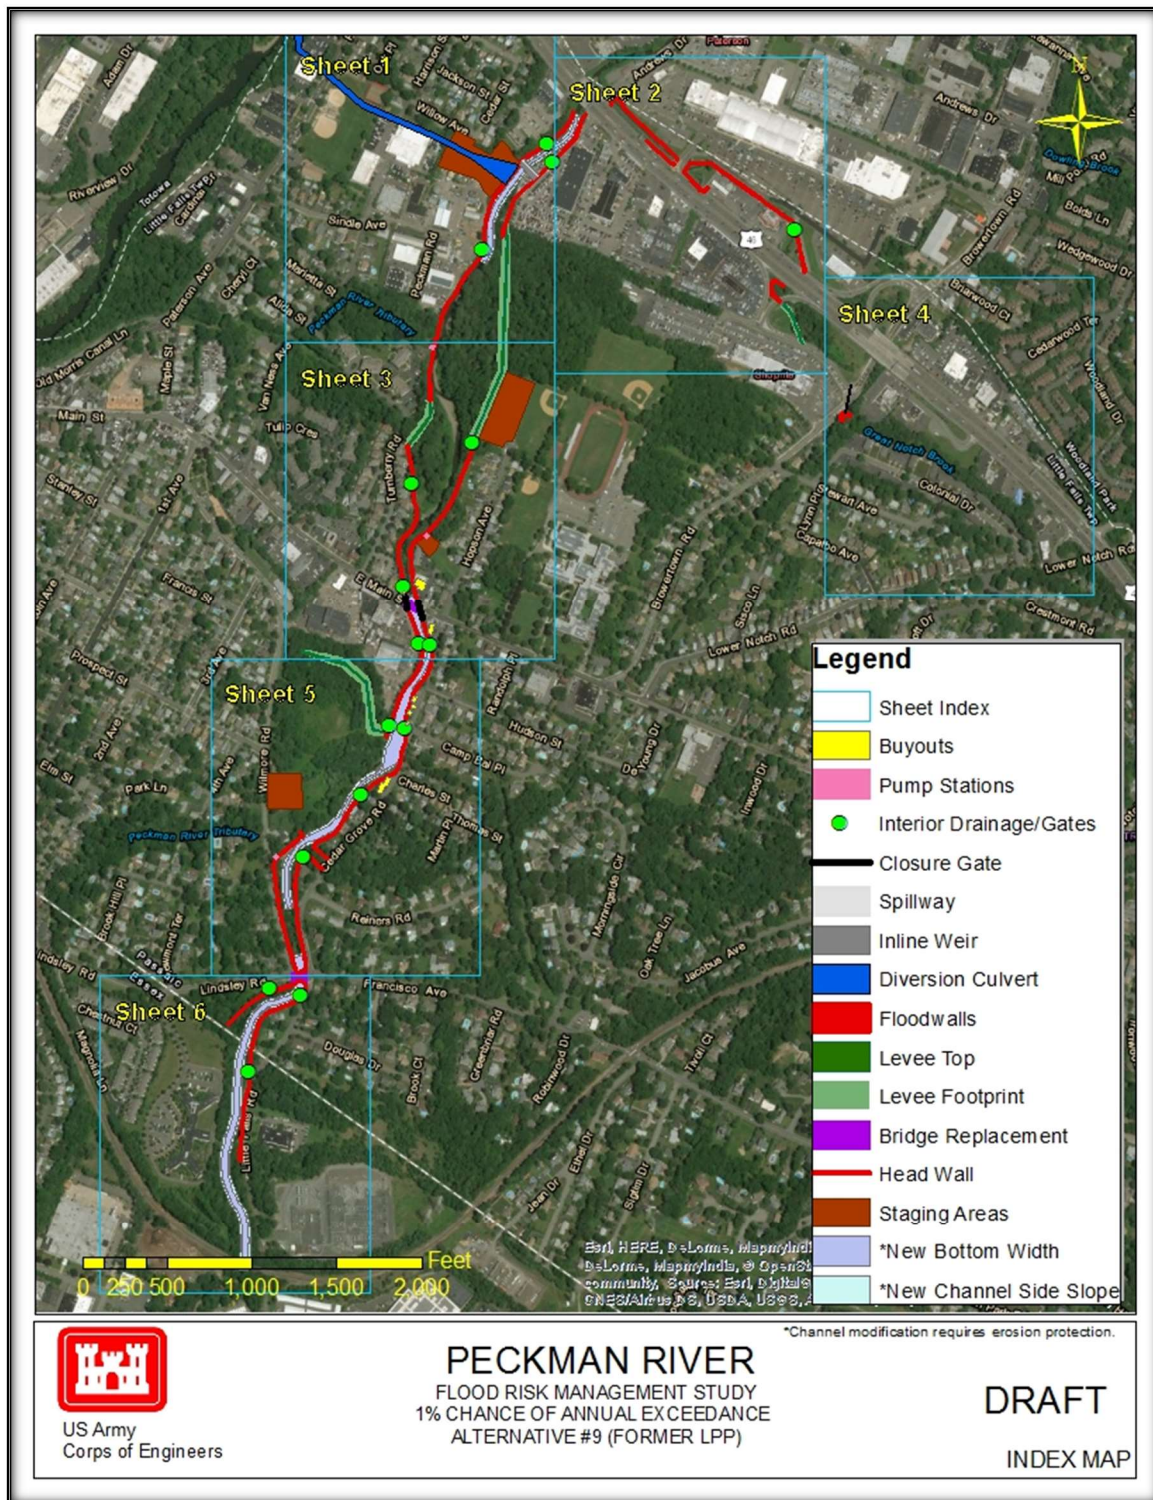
Alternative #9 – 100 yr. Combined Levee/Floodwall Upstream of Rt. 46 with Diversion Culvert & Great Notch Brook Floodwalls.
